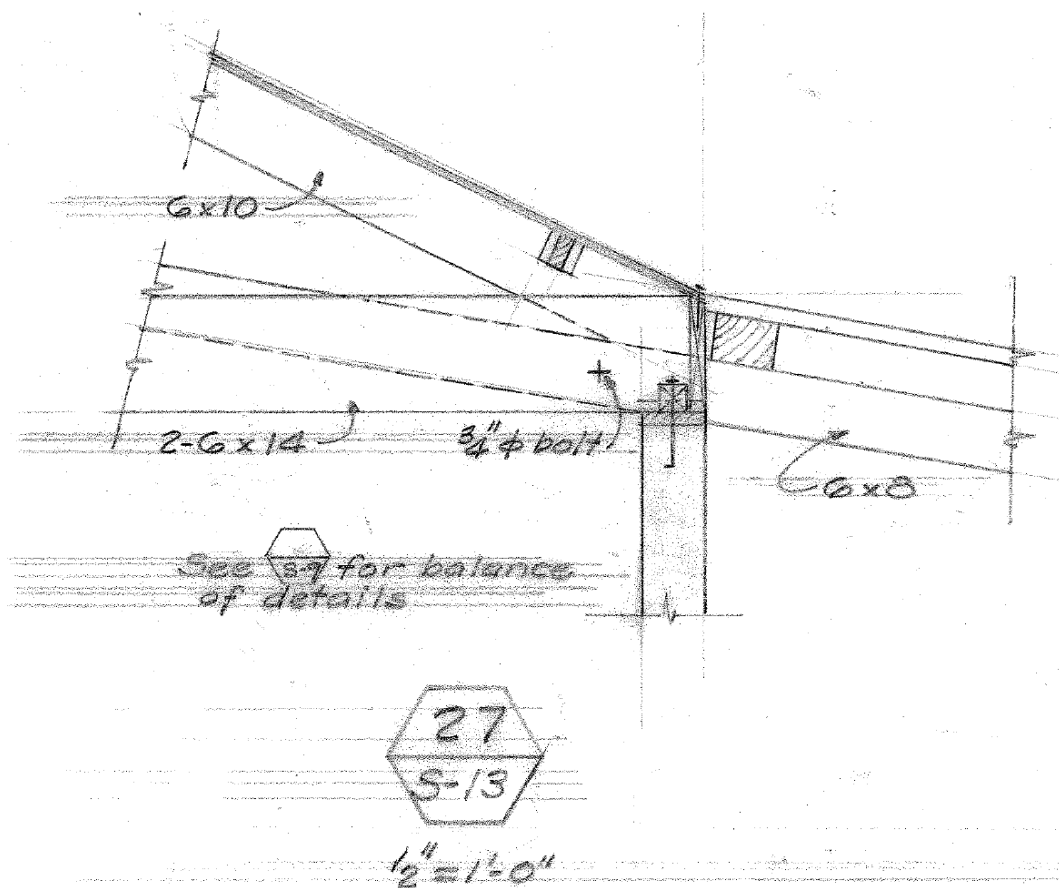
Detail 27/S13 - Roof Diaphragm to Wall Connection
